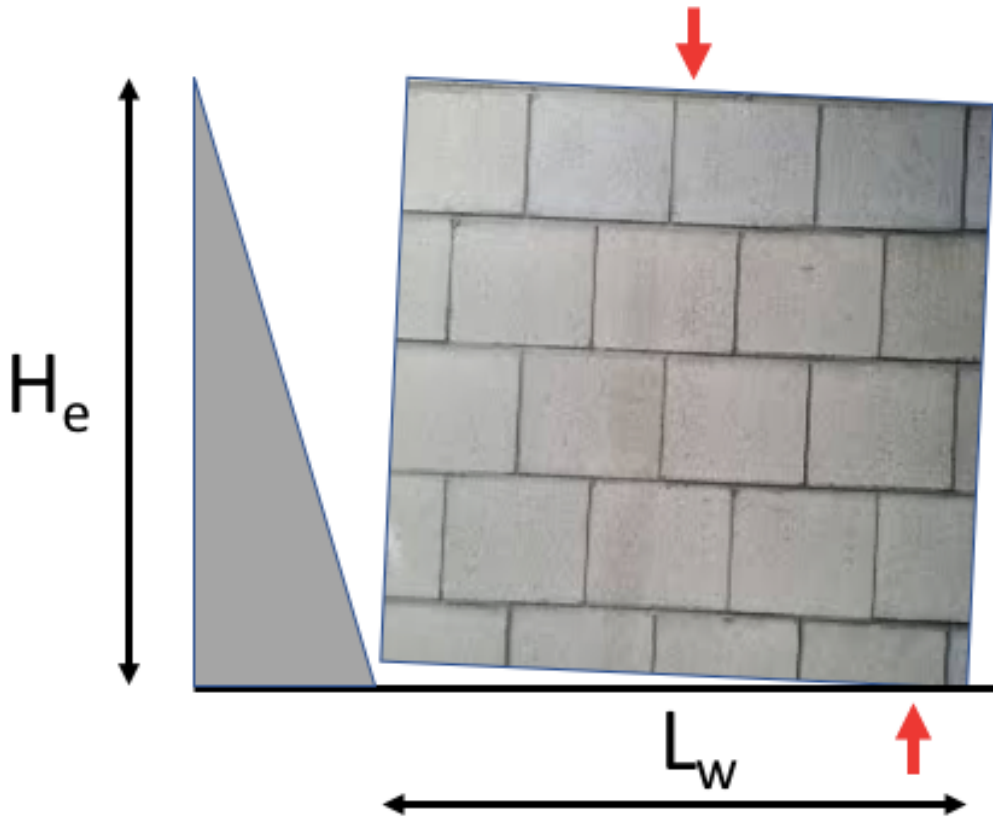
Schematic diagram of a cantilever model of swaying in-plane wall with effective height (H_e) and wall length (L_w) definition depicted
